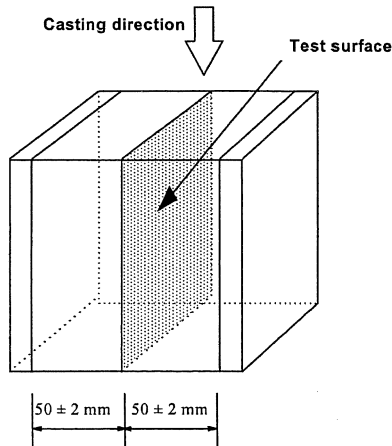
Illustration for sawing of slab specimens from a concrete cube.
